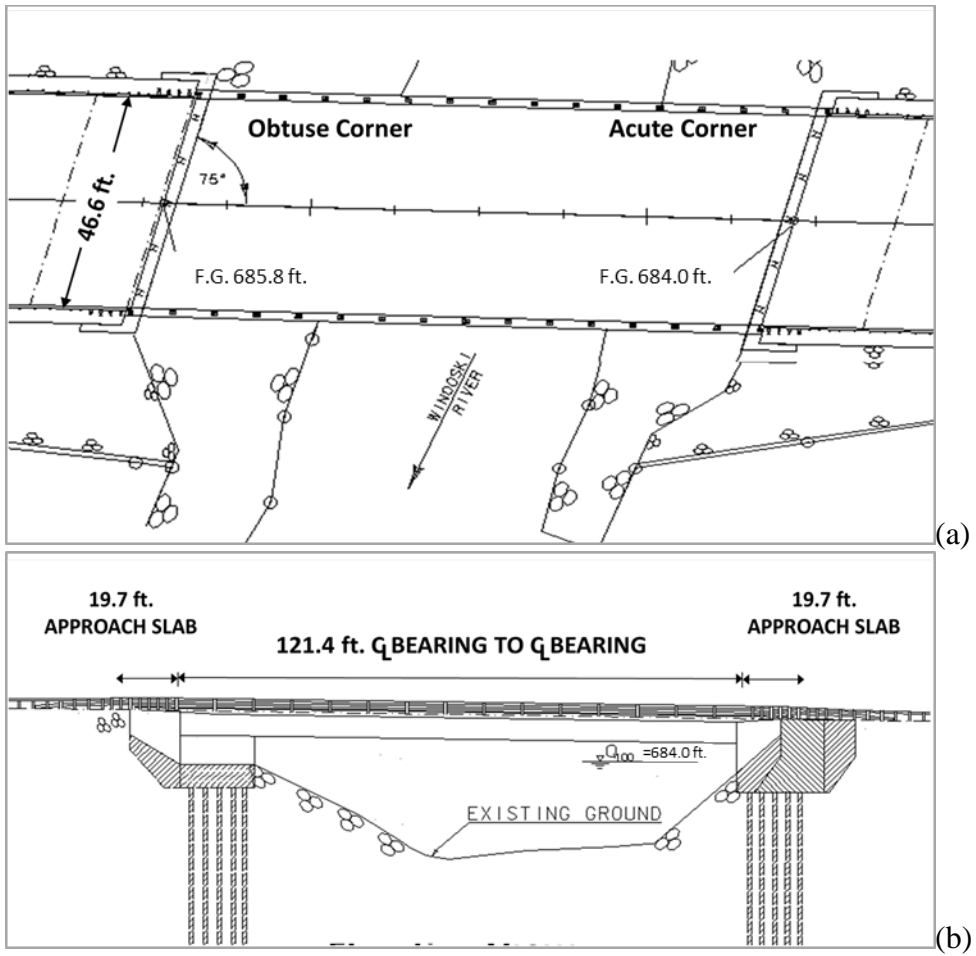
East Montpelier Bridge (a) plan view (b) elevation view
